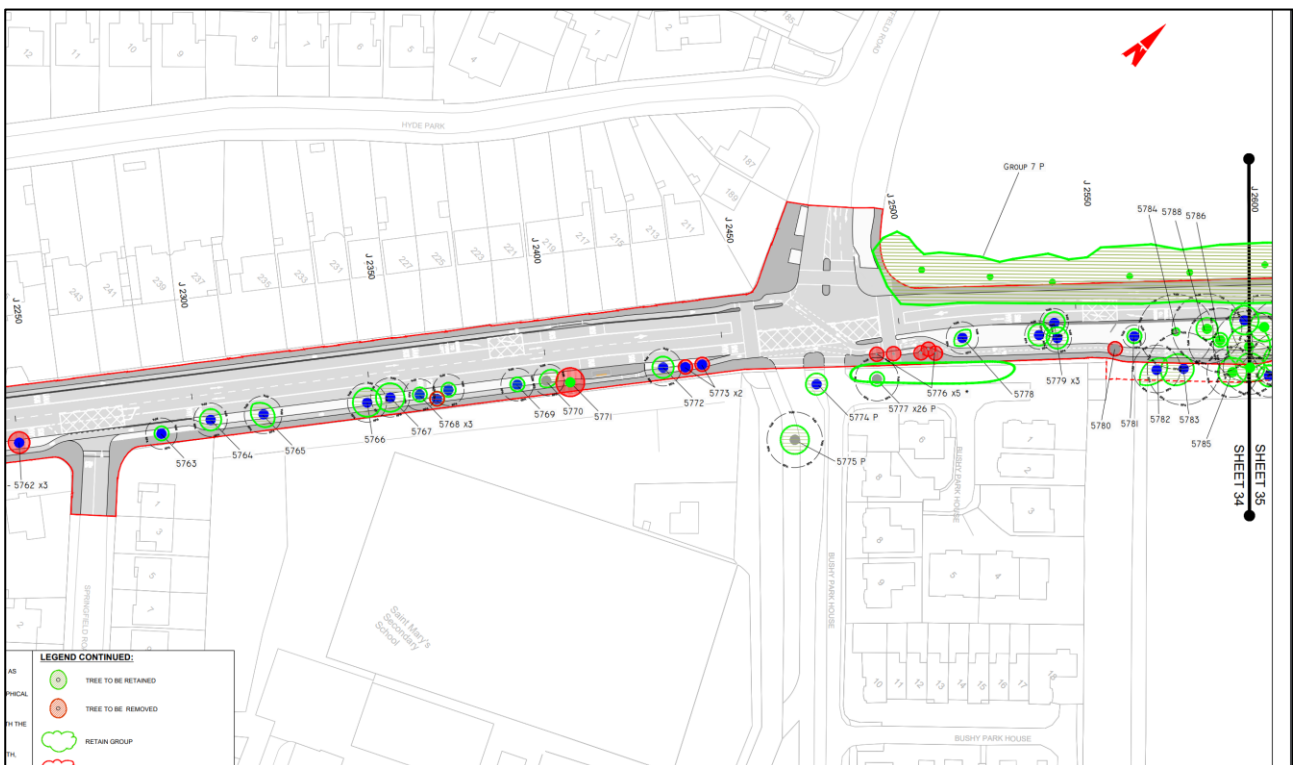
Extract from Tree Protection Plan Sheet 34 of 37
